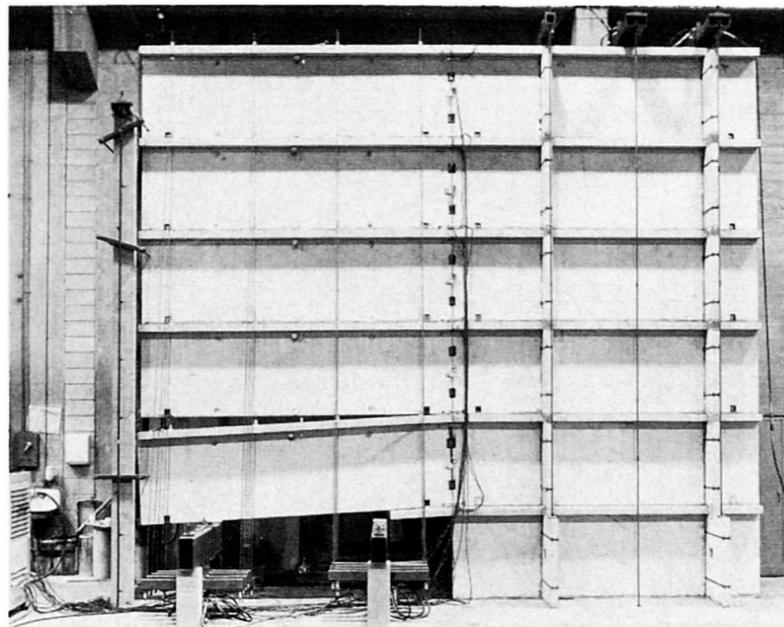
Test Structure After Fracture of Vertical Tie at Floor Level 2
